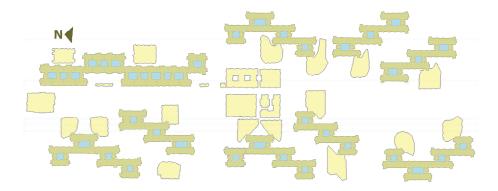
Buildings like Building\_02 (shaded darker) in Block 70, New Belgrade, with 40 atriums that can be glazed (shaded blue) | Buildings disposition from geosrbija.com
